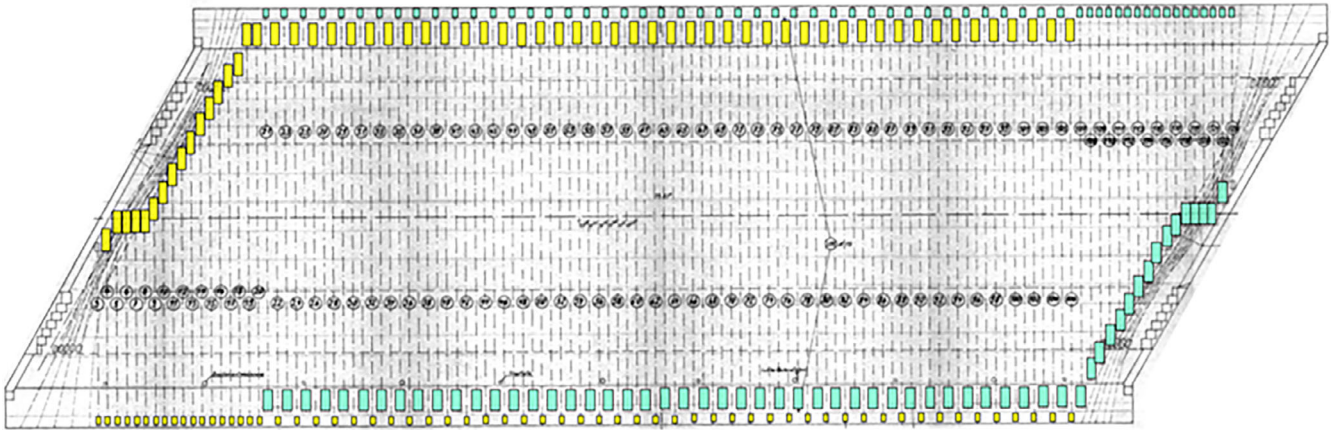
Existing transversal reinforcement—section bridge axis/t-beam.
